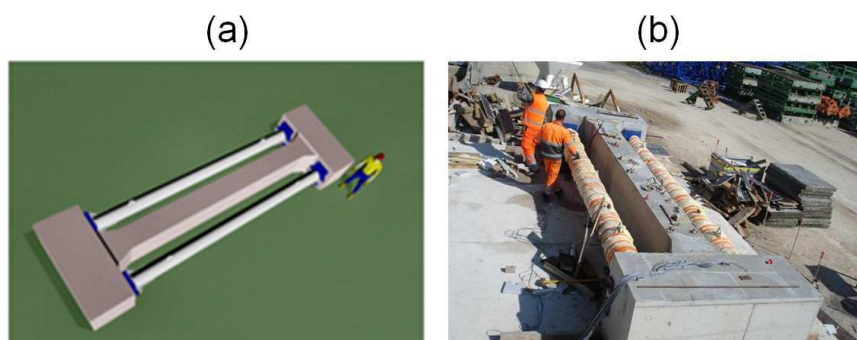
3D specimen model (a). Photo of the specimen after the removal of formwork and thermal isolation (b). Images from ConCrack home page
